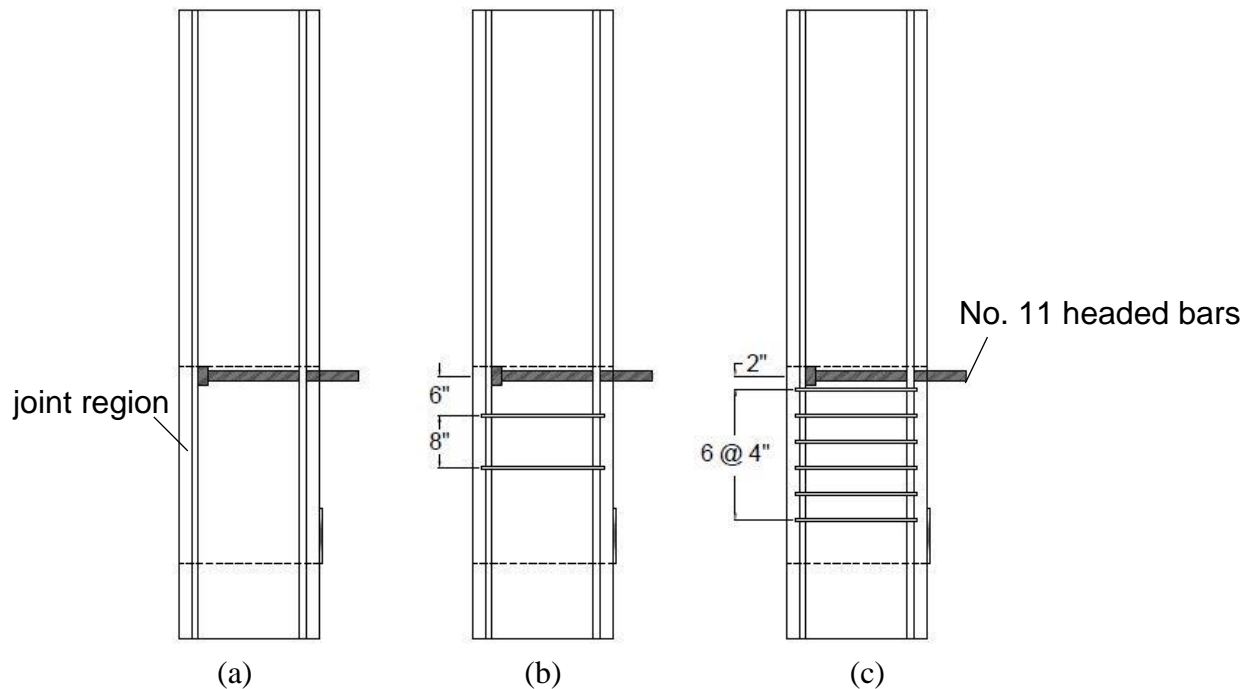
Confining reinforcement for No. 11 headed-bar specimens (a) no confining reinforcement, (b) two No. 3 hoops, (c) six No. 3 hoops
